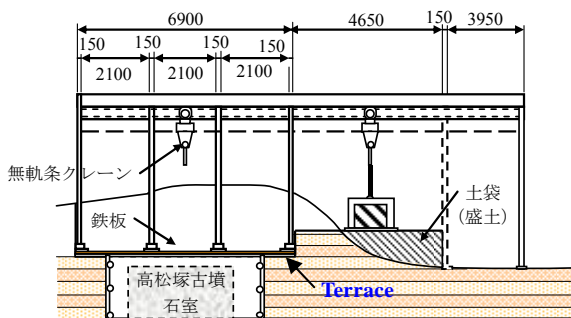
Schematic Cross-section of Dismantling Site with Crane Foundations
